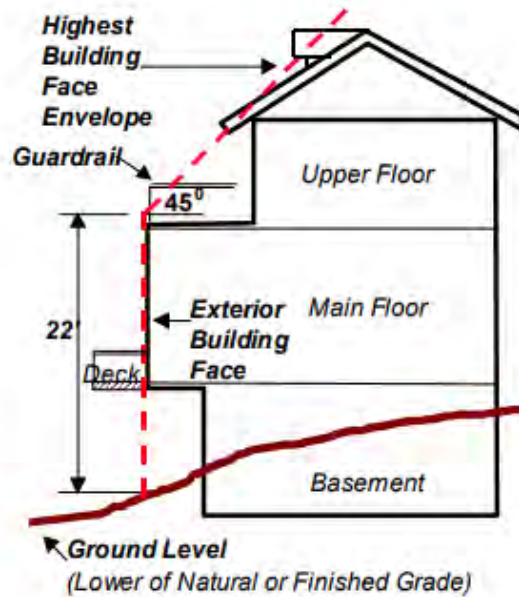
Diagram from Zoning Bylaw how to measure highest building face envelope
